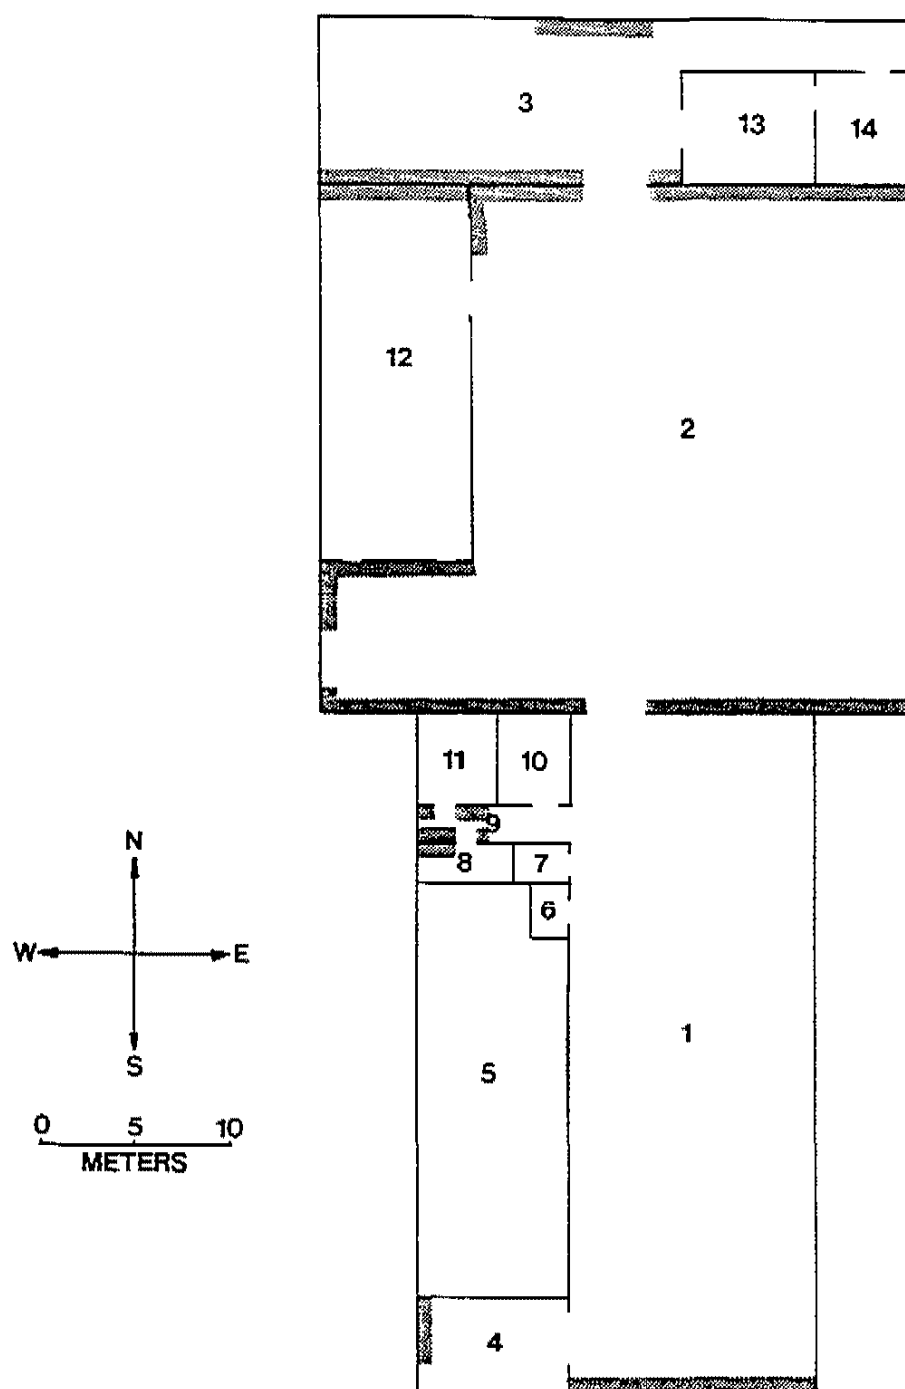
Plan of Warehouse Indicating Lower Wall Areas (shaded) Where Contamination Exceeds Criteria.
